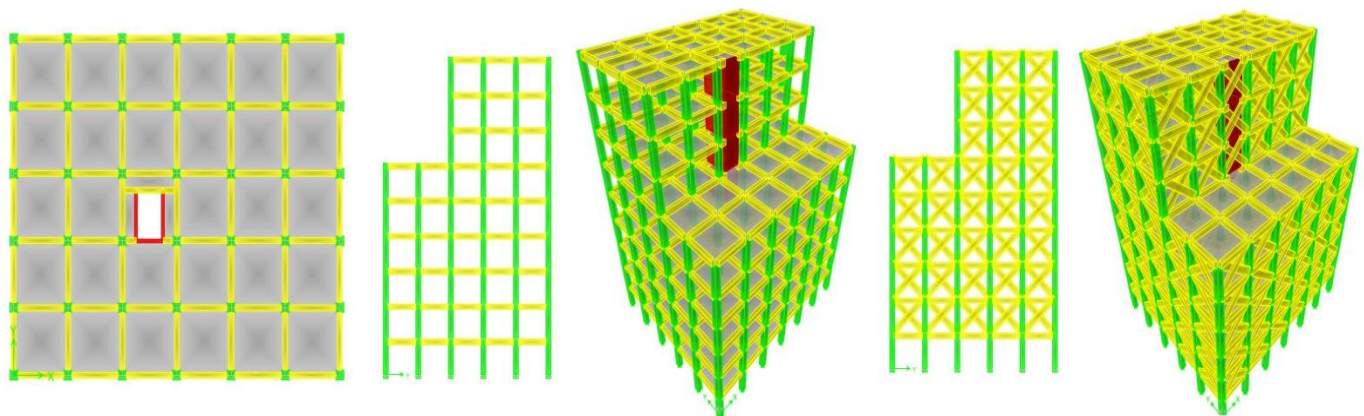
Plan, Elevation and 3D view of bare and infill frame for model-5 and model-6 respectively.
